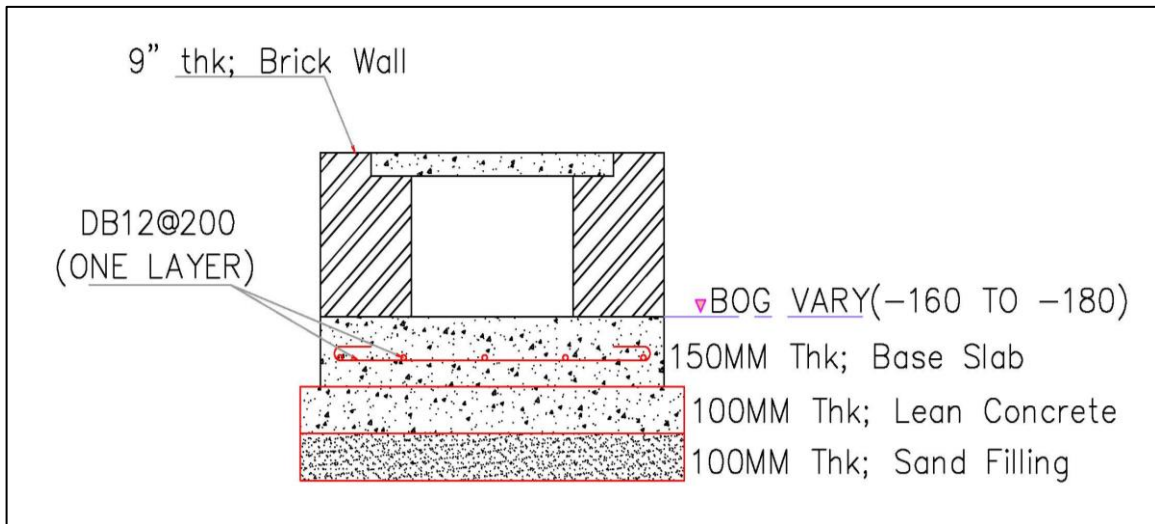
Vertical Cross-section of Factory's Drainage Channel
